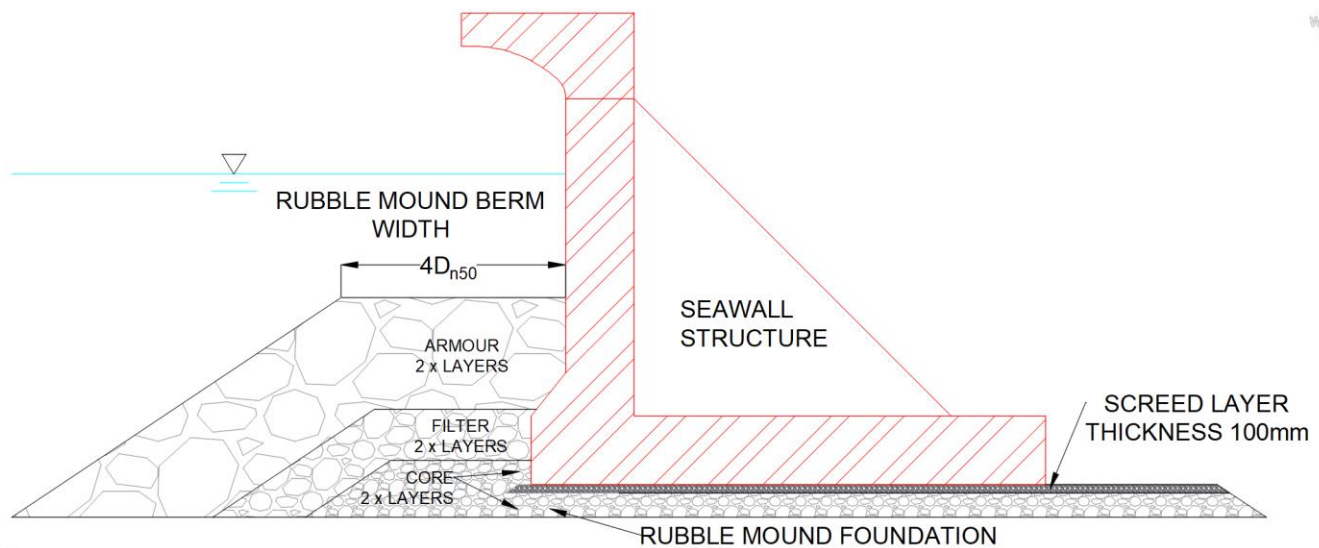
Cross-section of recommended rubble-mound berm and foundation for vertical seawall
